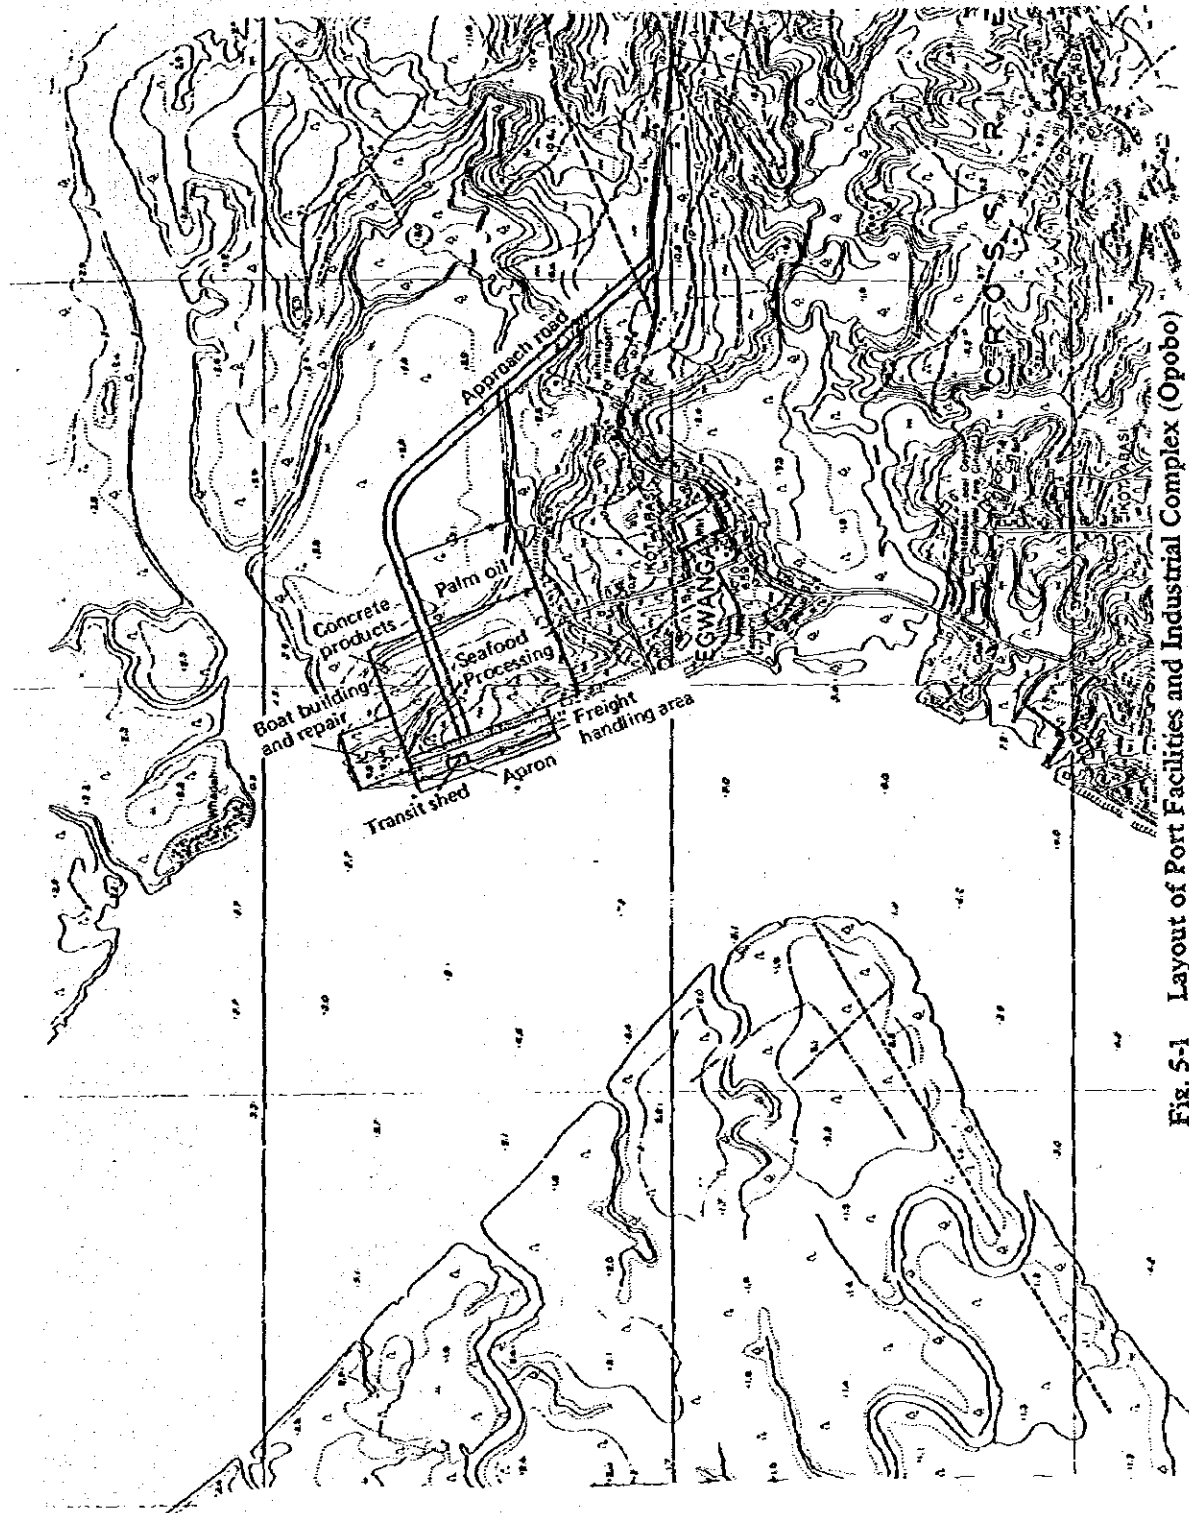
Layout of Port Facilities and Industrial Complex (Opobo)
